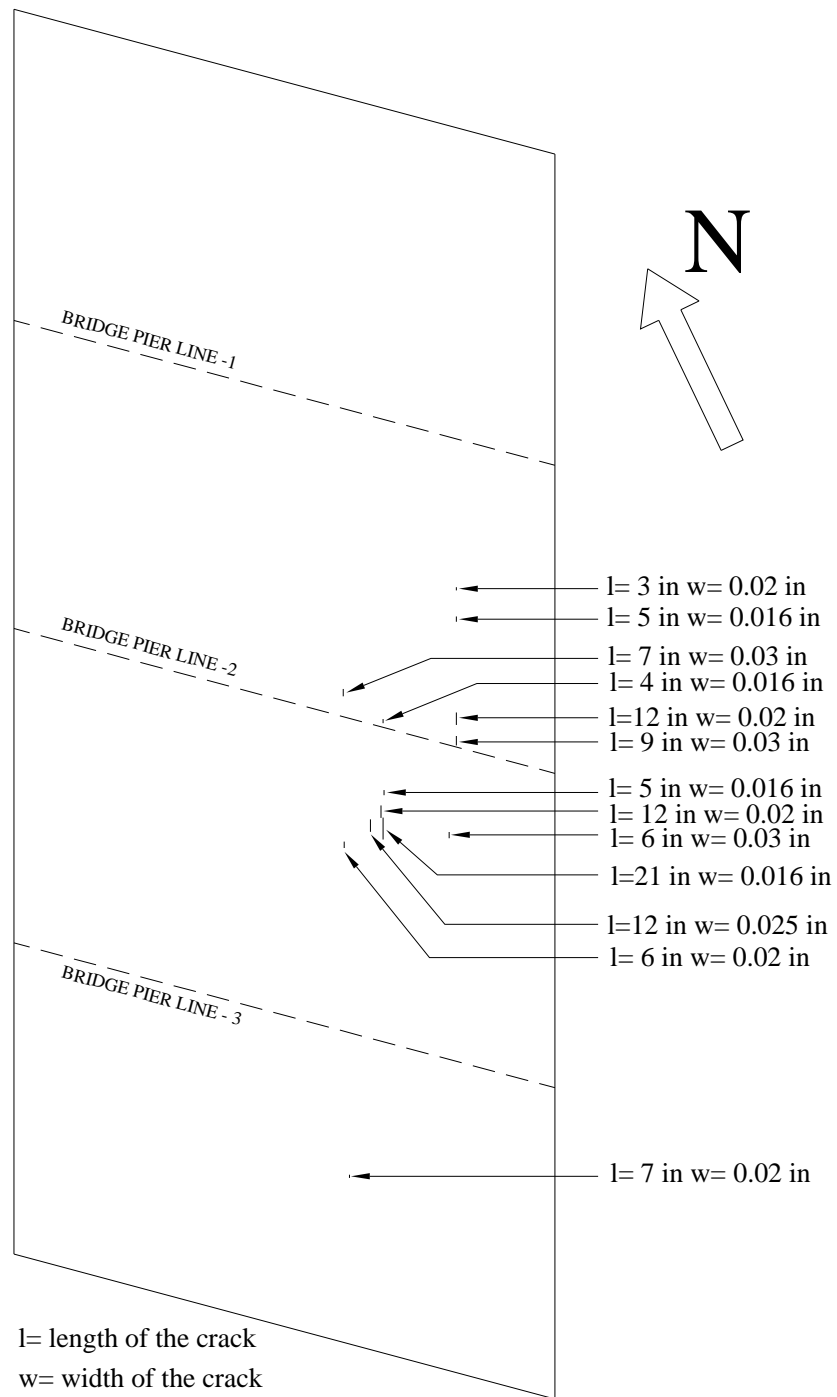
Bridge deck 5500 crack map at 7 days.
